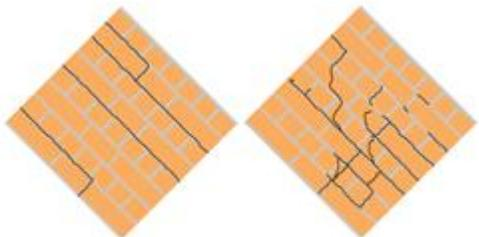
Crack formation of test specimens; (a) Control wall panel (b) retrofitted wall panel
